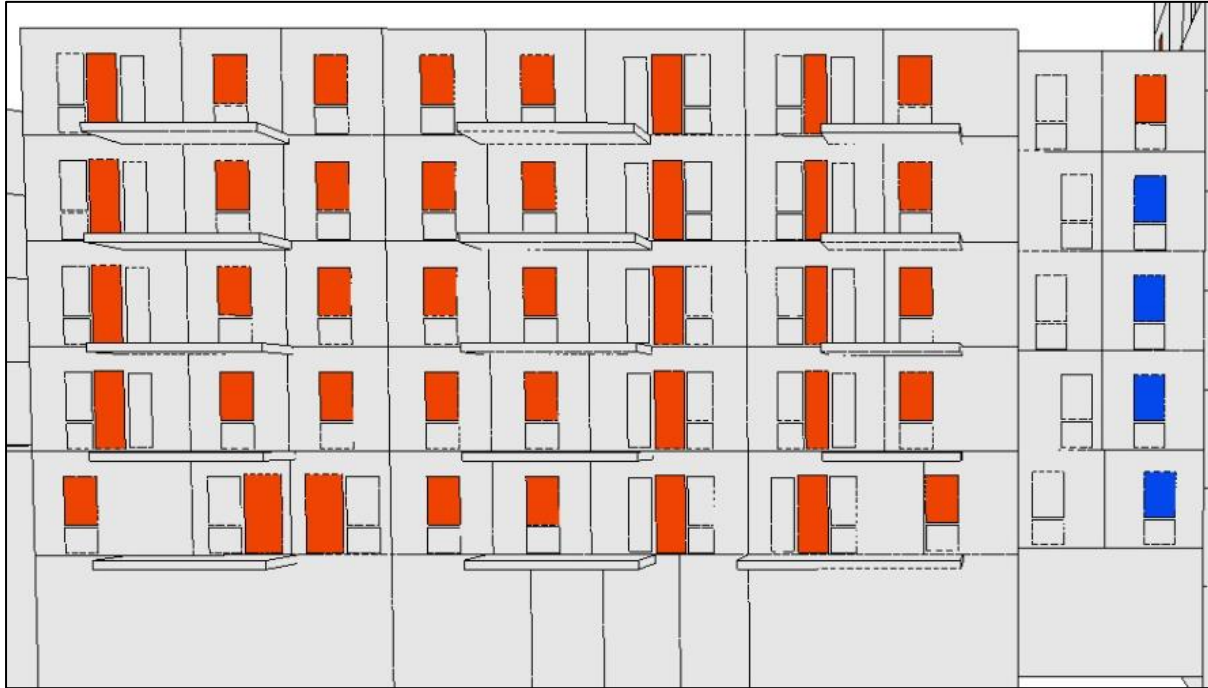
Windows achieving 1.5 hours of sunlight - Northeast elevation of Building 2A (modelling software)
